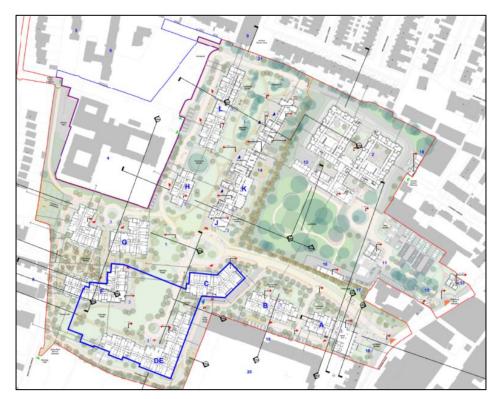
Proposed Site Layout showing proposed basement outlined in blue
